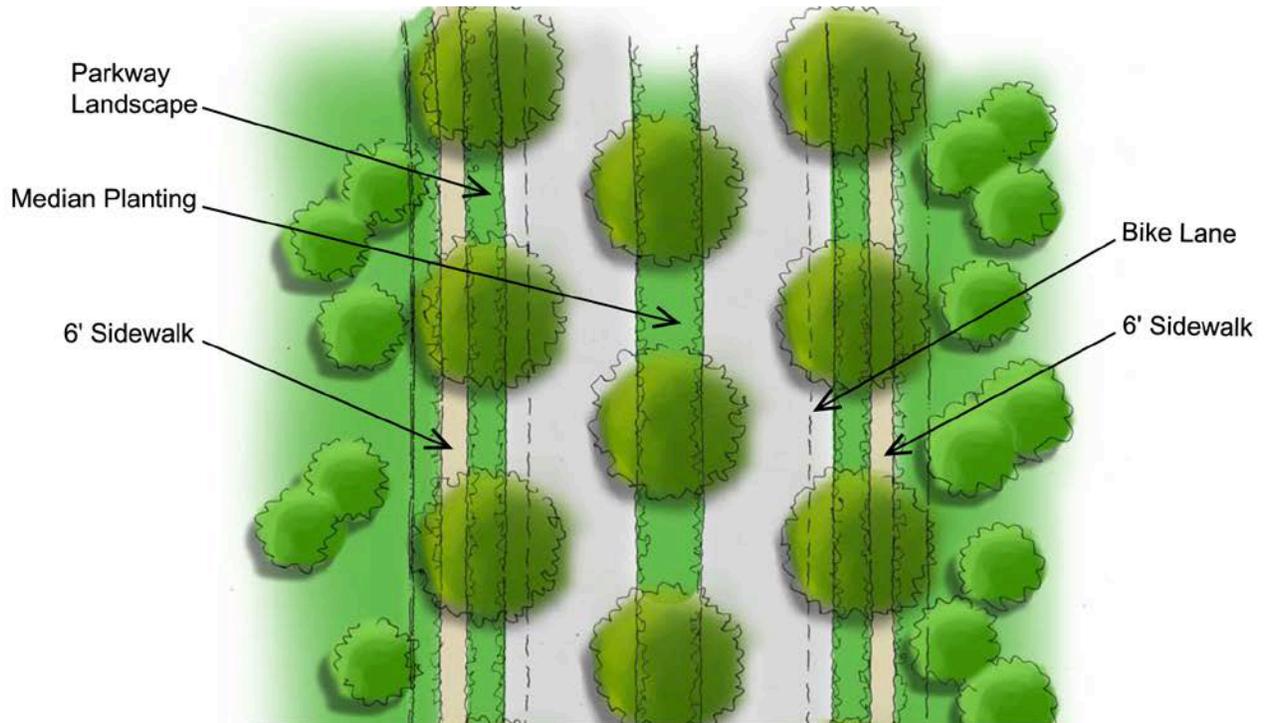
, Modified Collector Streetscape - 'B' Street
